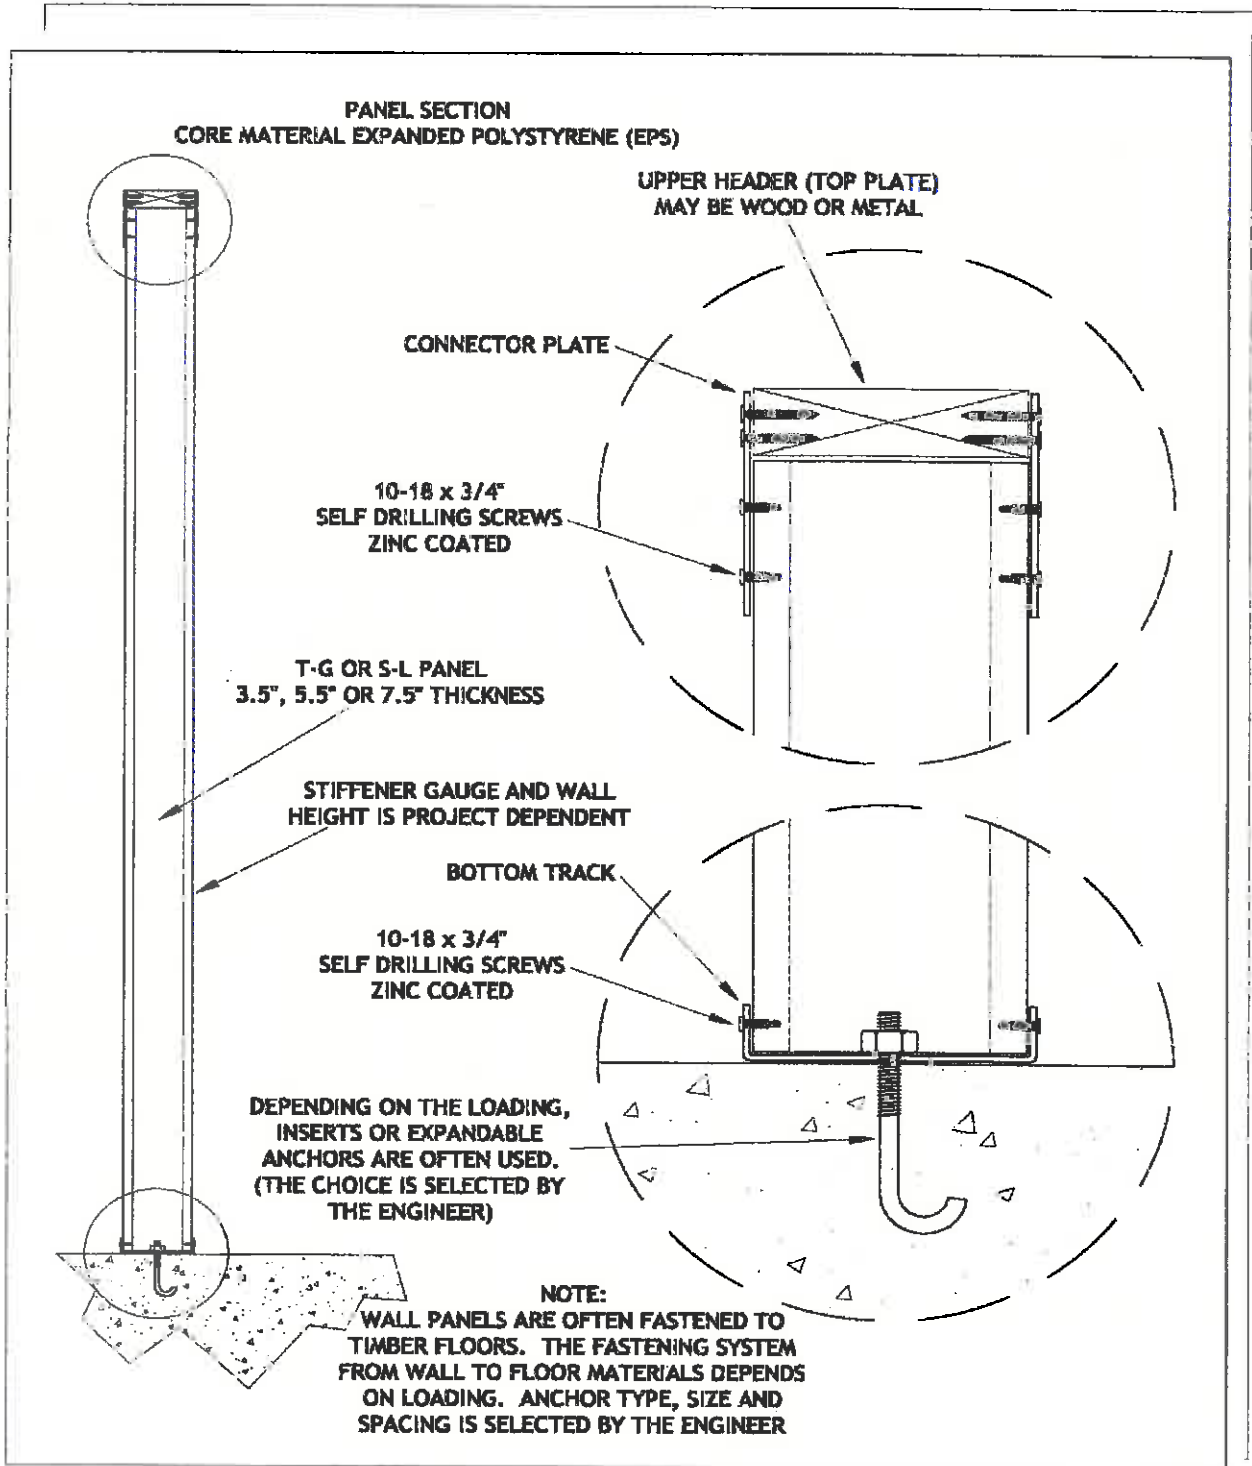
T-G/S-L Wall Panel Floor Anchoring System
